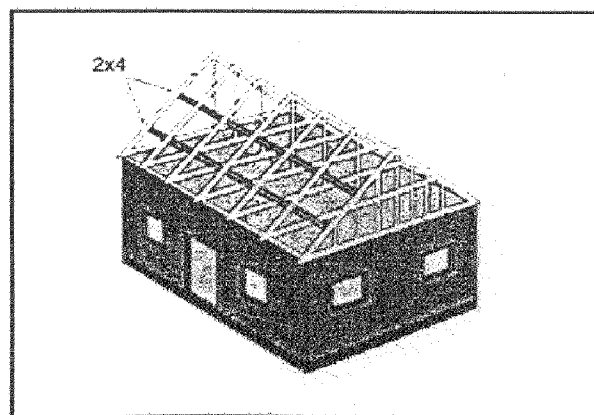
Gable roof reinforced with 2"x4"x8' elements. The distance between reinforcing elements should no be greater than 1.20 m.
